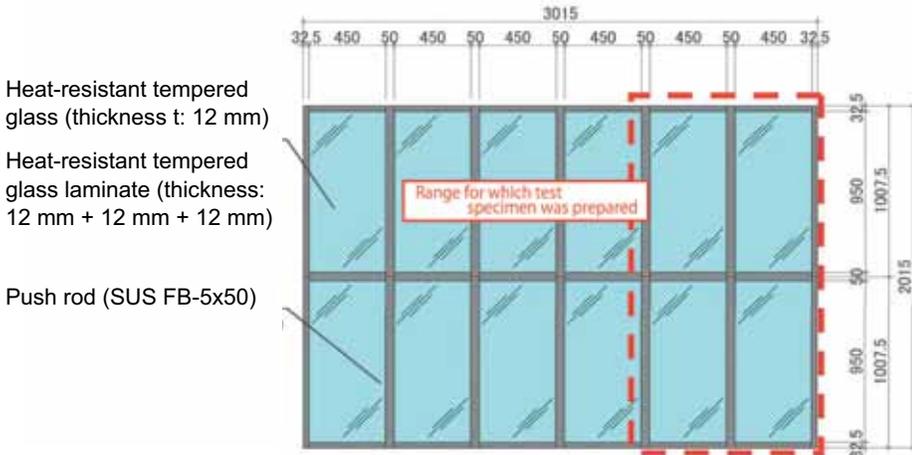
Location of sightseeing deck (Tembo Deck) used as test specimen.
